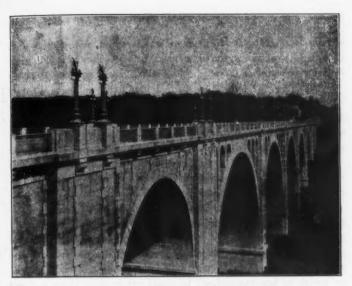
Connecticut Avenue Concrete Arch Bridge, Washington, D. C.
